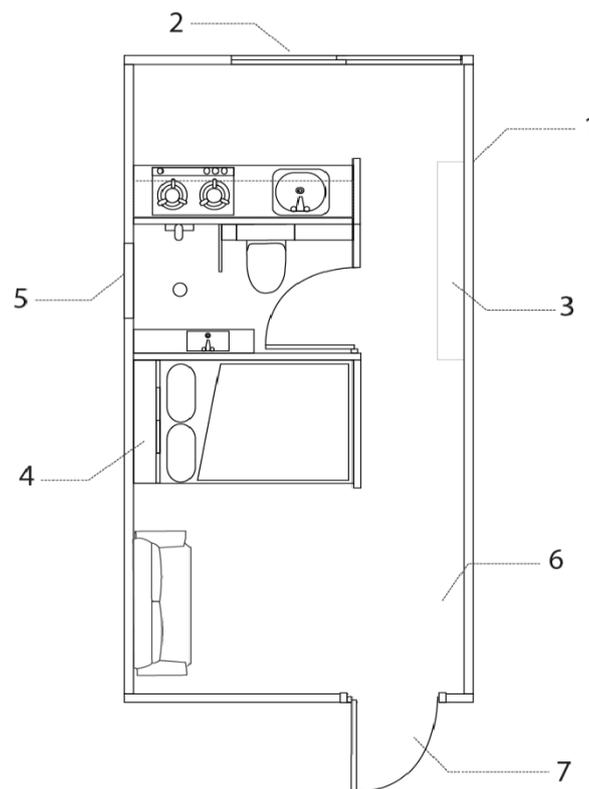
Plan of combined parts as one unit. 1: Right side wallboard; 2: Glass sliding door to the balcony; 3: Storage space; 4: Bed and Storage space; 5: Left side wallboard; 6: Living room space; 7: Main front door. Plan from martinlof.se/projects/vastberga/ (Redrawn by the author)
